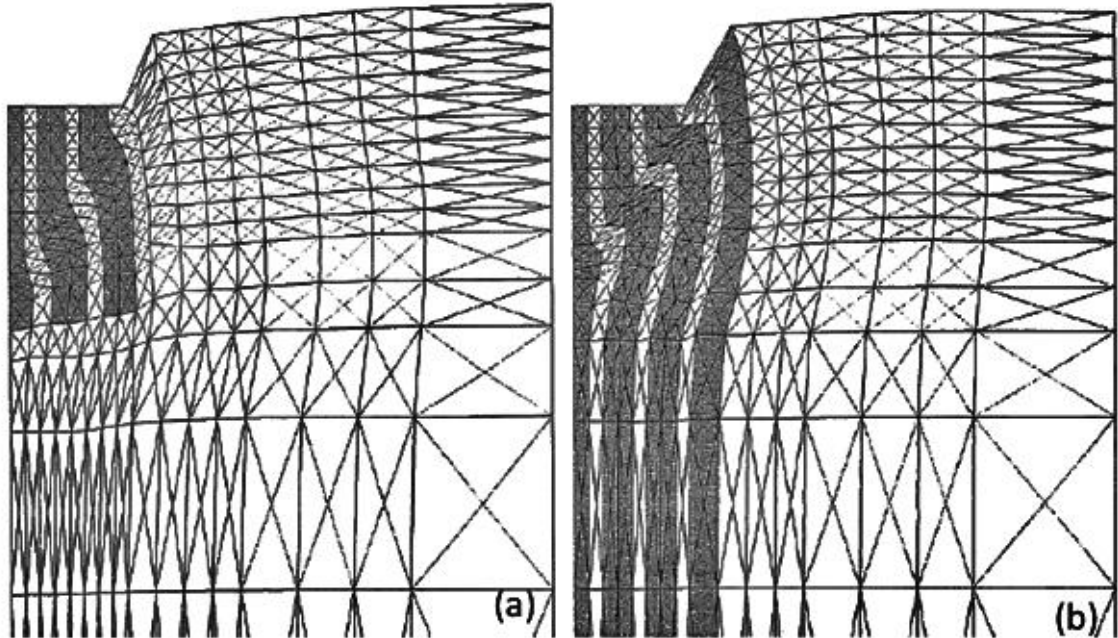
Deformed group of (a) short columns and (b) long columns with columns present outside the footing area. Clay is shown in white and columns are grey.
